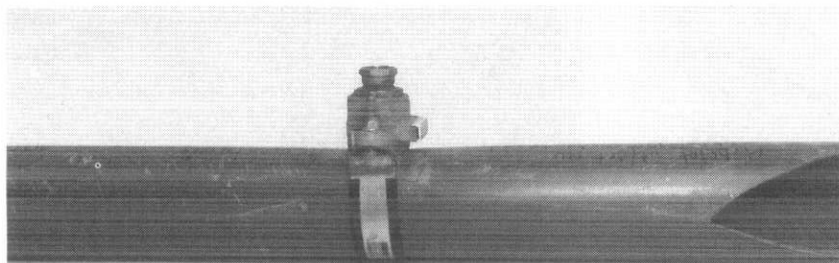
A failed PVC pipe at a saddle for house connection intended for DCI pipes.
